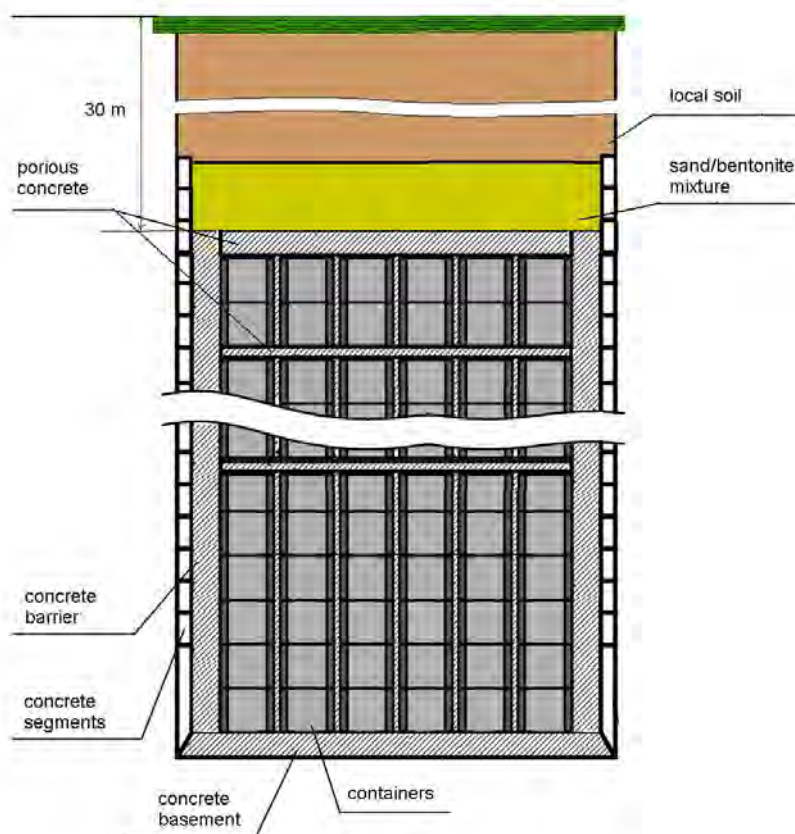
Conceptual design of IDDF: cross section of closed shaft-type disposal facility. The shaft lining is made of precast concrete segments.
